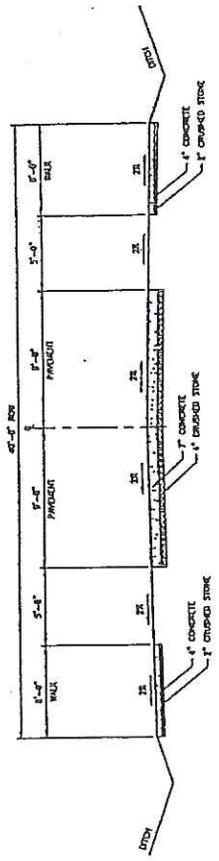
Exhibit B illustrates the proposed typical sections for the roads, streets and avenues for the Town Center area.
